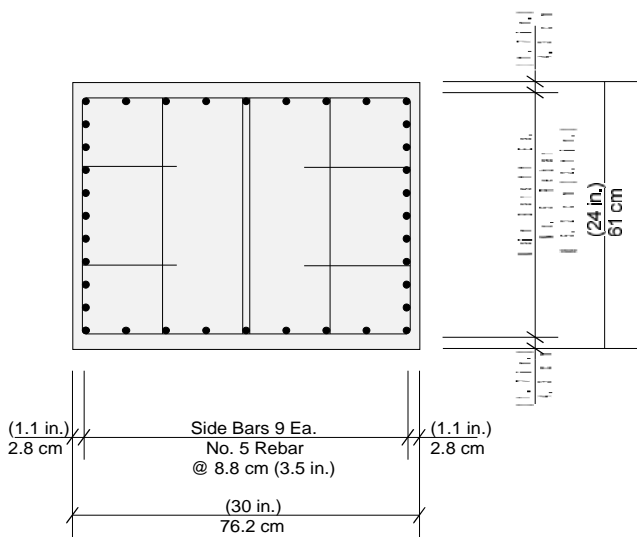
Layout of Reinforcement in Reinforced Concrete Model Bent [From Ref. 3]
